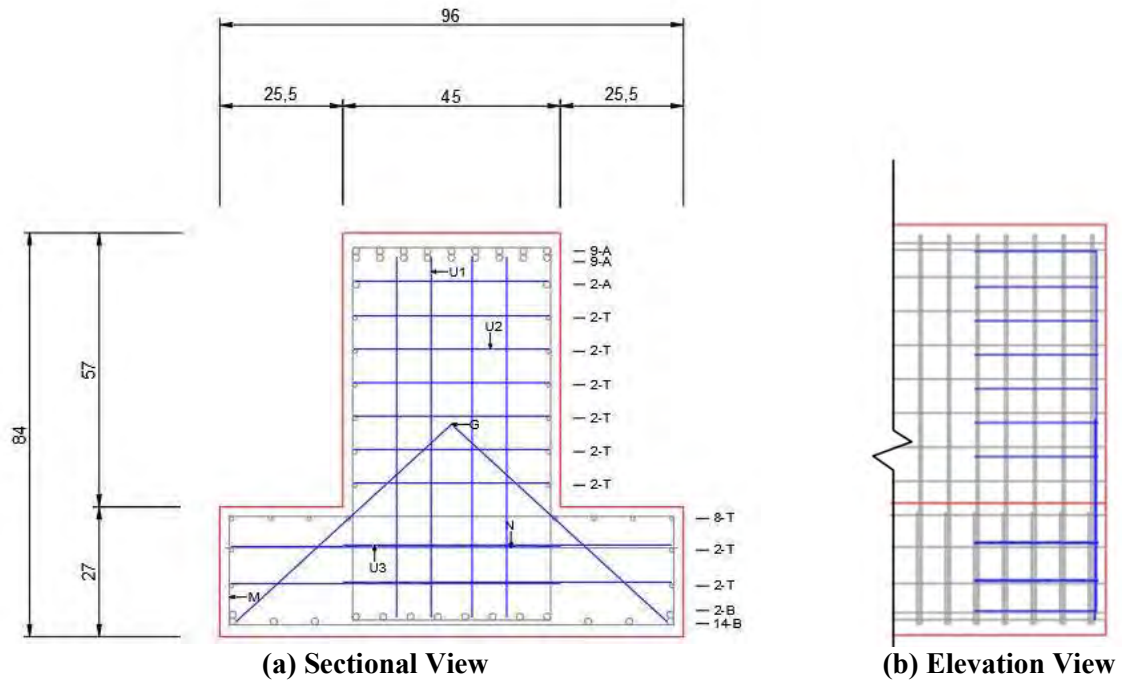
Bent 2-End View of Traditional Design with End Bars in Case 3 (unit: inch).
